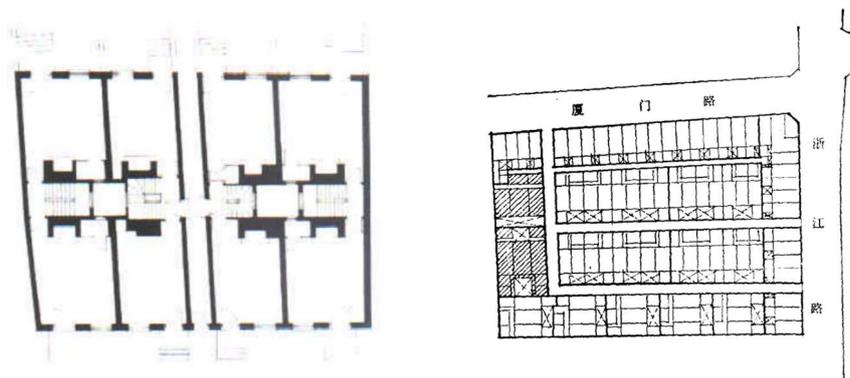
Residential floor plan of No. 52-55-Newington Green, London (Source: " THE ORIGINS AND DEVELOPMENTS OF TOWN HOUSES")
